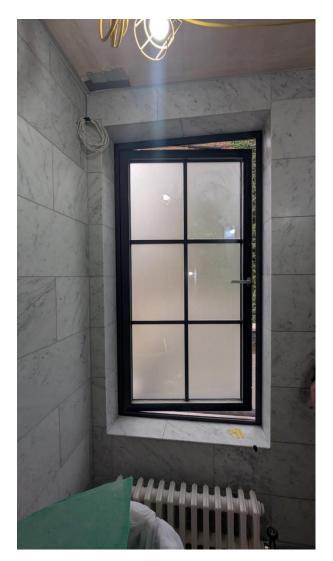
(above): Interior photo of the first-floor window (Source: Officer site visit photo)
